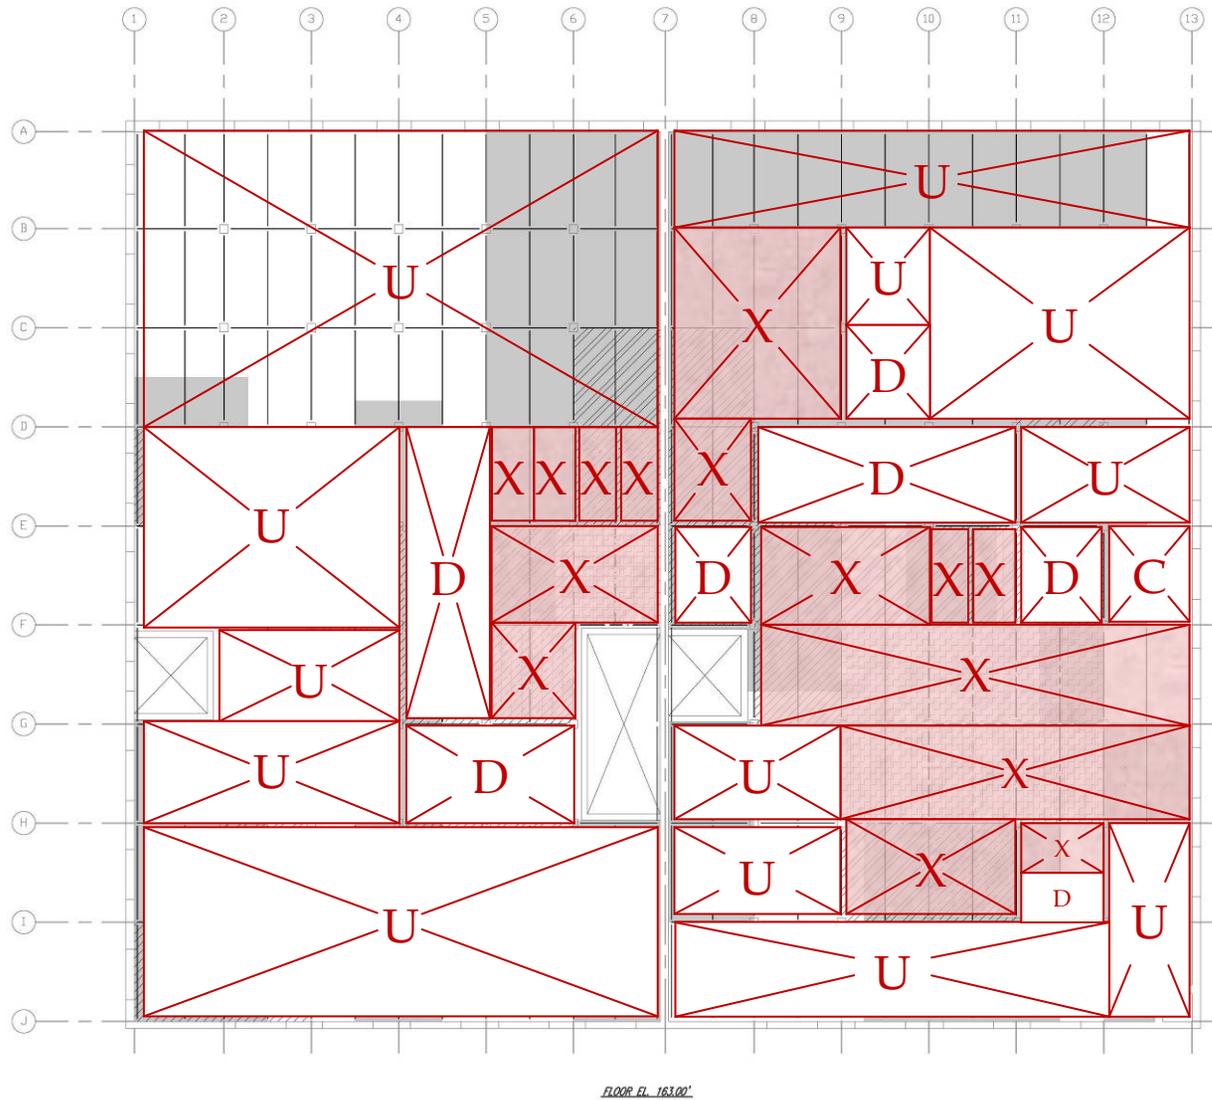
Fourth Floor Framing Plan - 2000 and 2011 (red)
